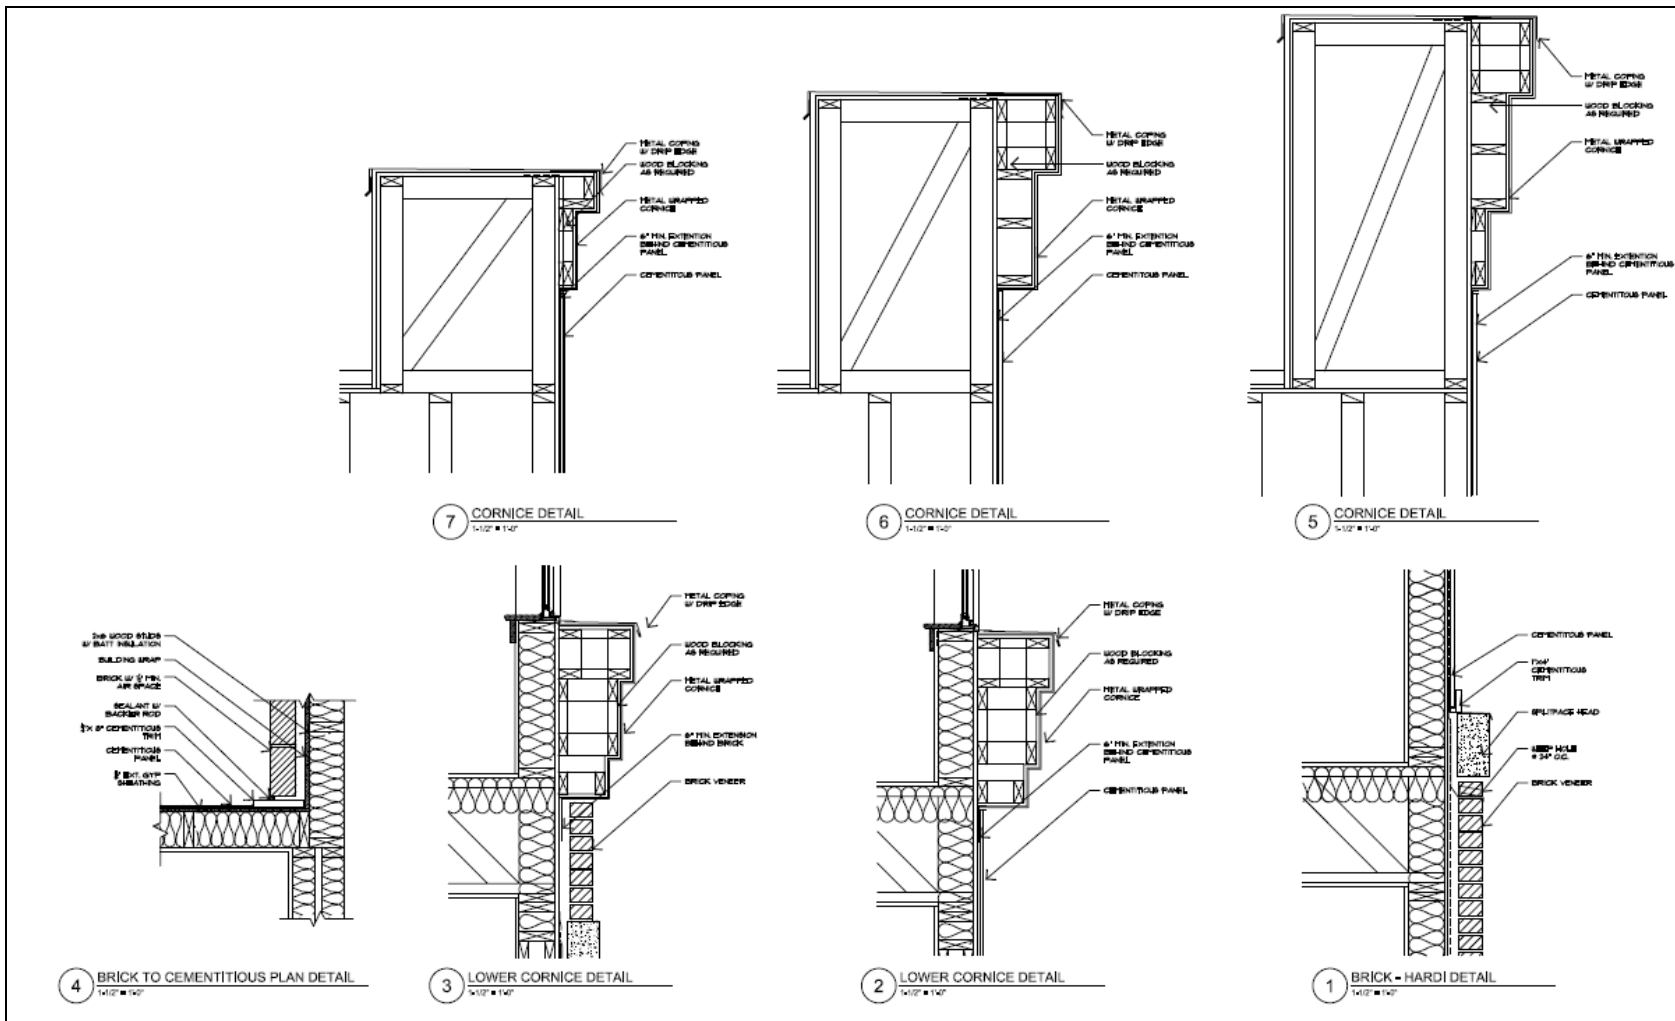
Cornice and HardiePanel details on multi-family buildings.
